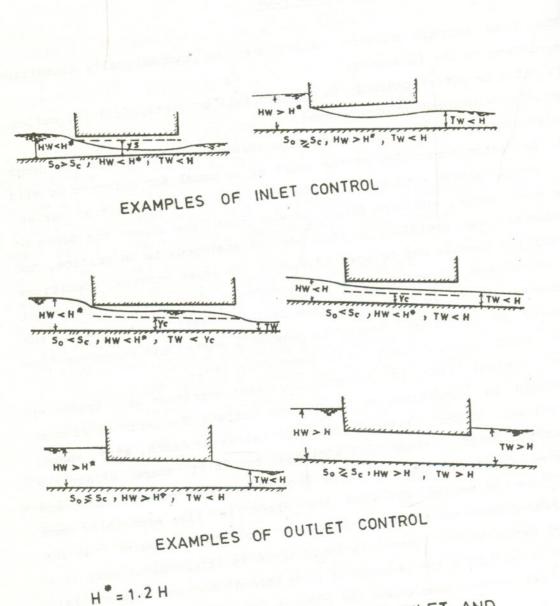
CULVERT FLOW UNDER INLET AND OUTLET CONTROL .
